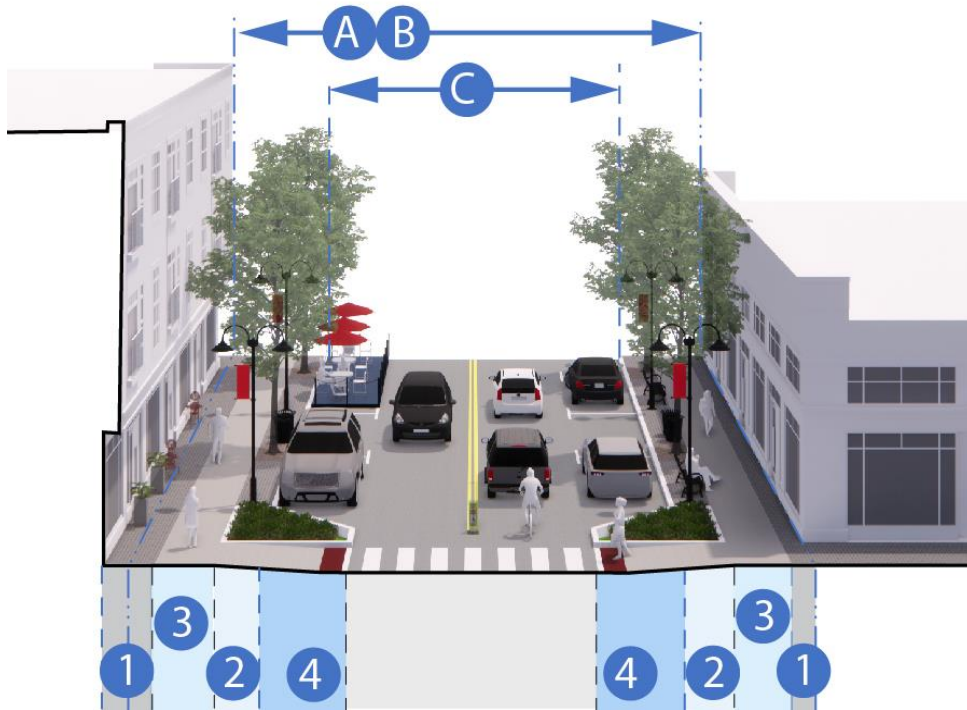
COMPLETE STREET TYPES AND STANDARDS
